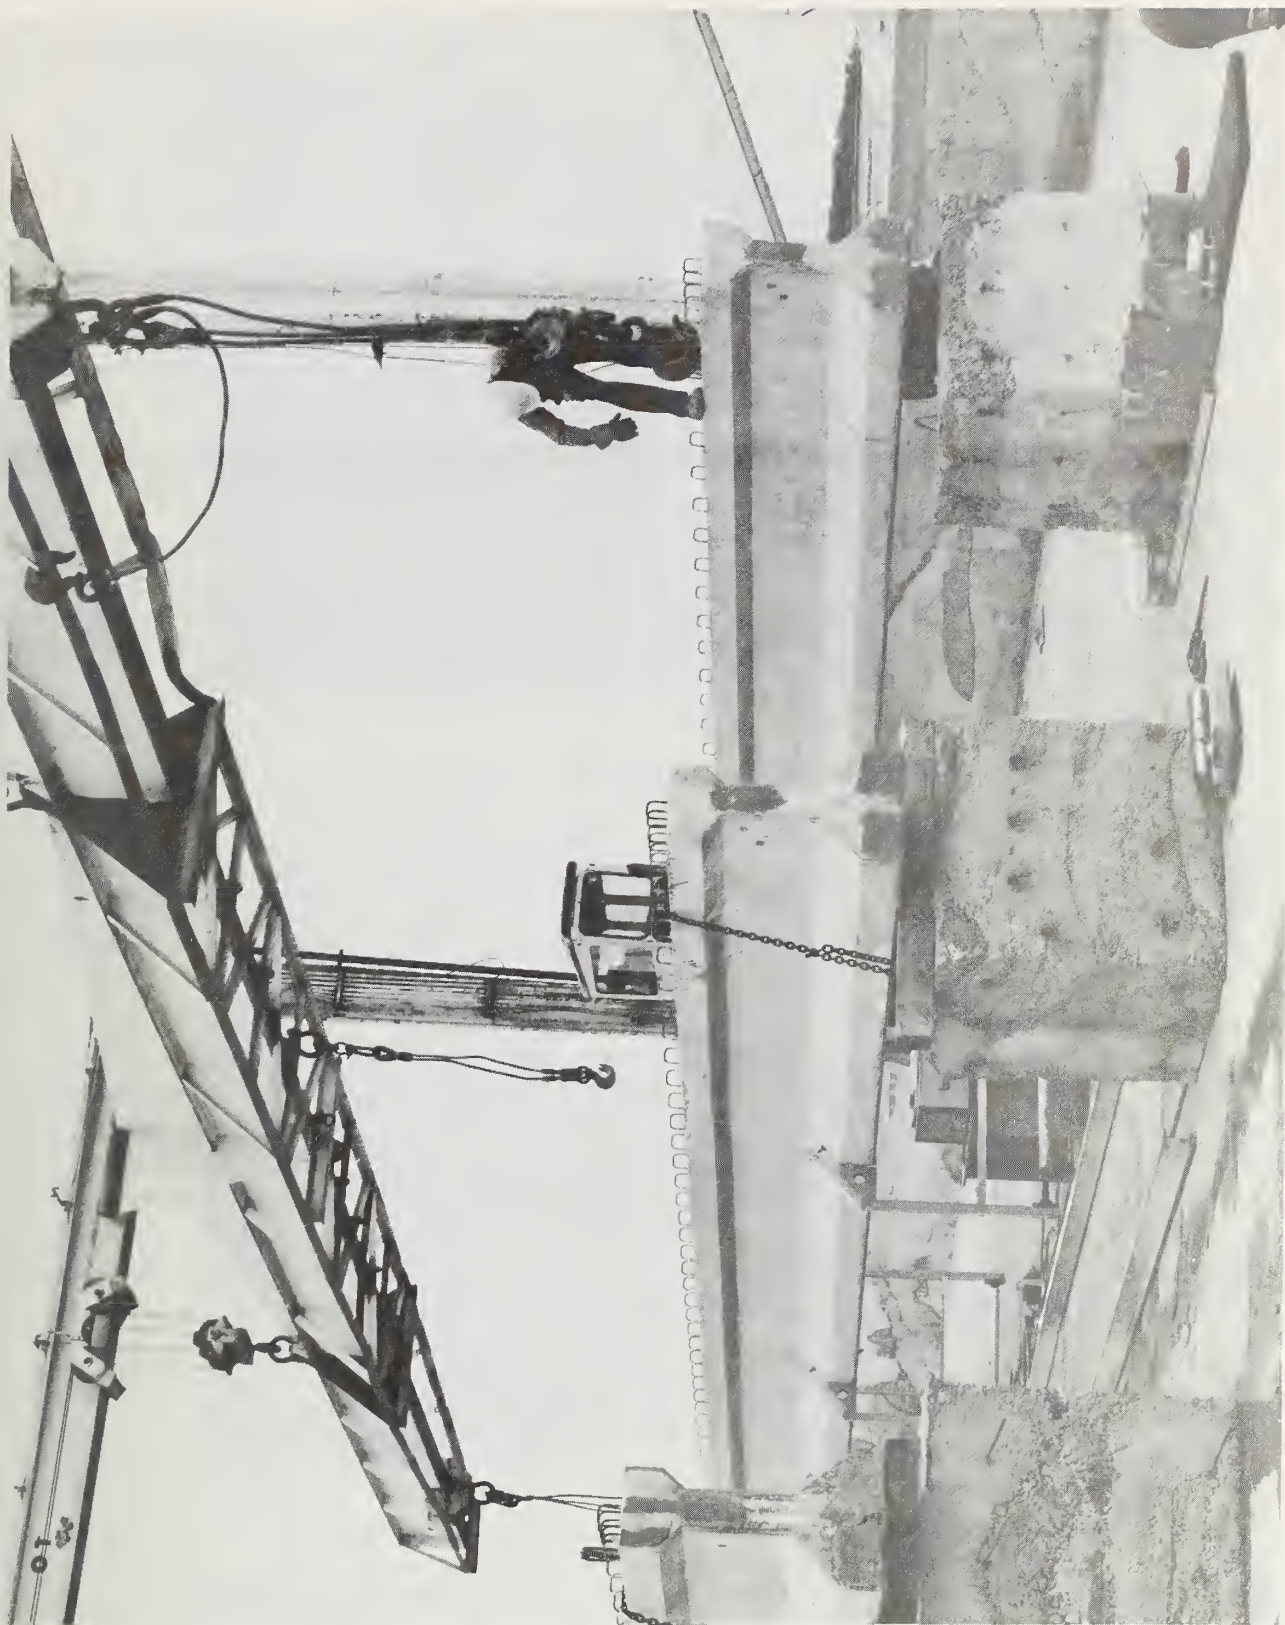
VIEW OF 80-FOOT (24m) TYPE "C" GIRDER BEING SET UP FOR INSPECTION
